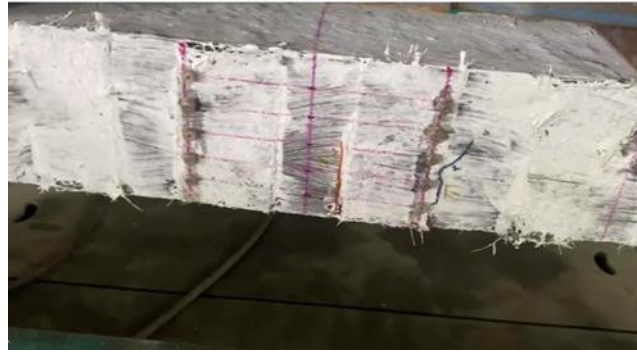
Cracked patterns on 90 degree strip wrapped collapsed beam after loading
